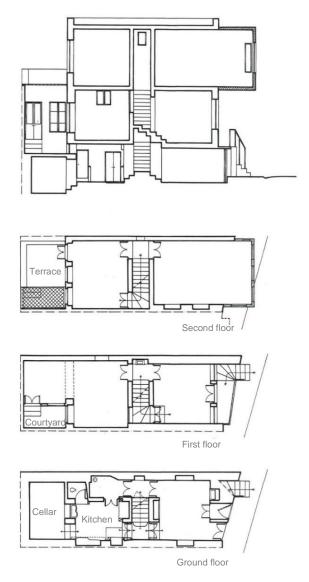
Large bourgeois corridor house with several floors. 1st. floorplan. Source: The author, after David and Hubert, 1982, p. 104
